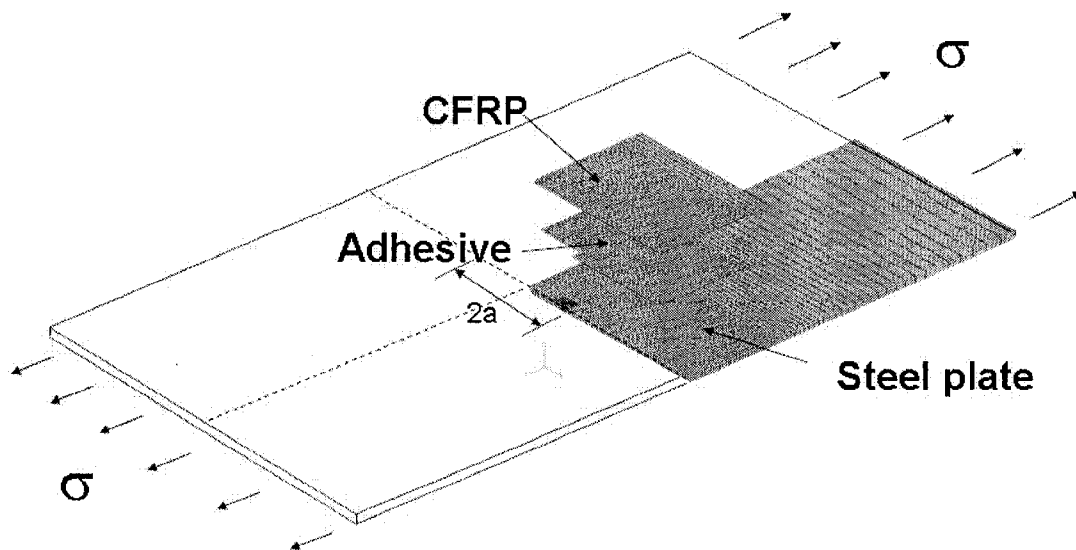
Finite element model of central cracked plate with single-side CFRP patching
